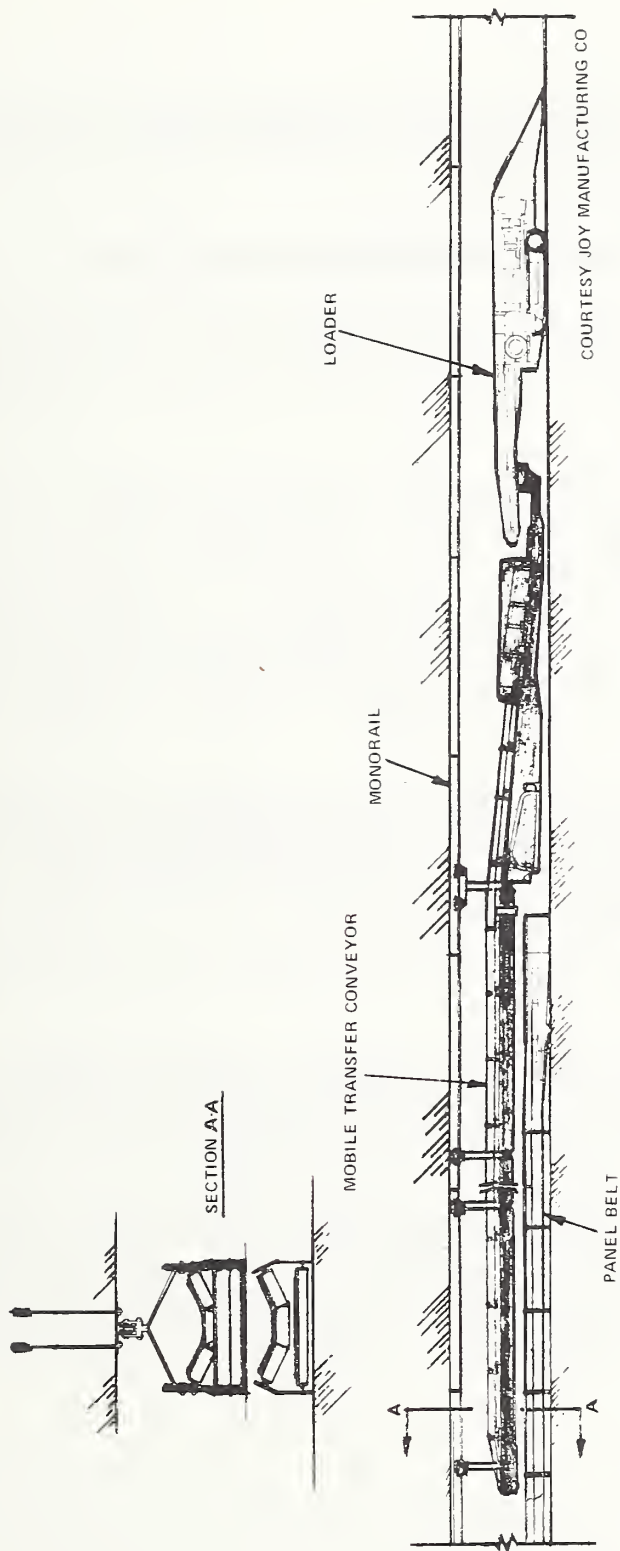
MONORAIL-MOUNTED TRANSFER CONVEYOR
